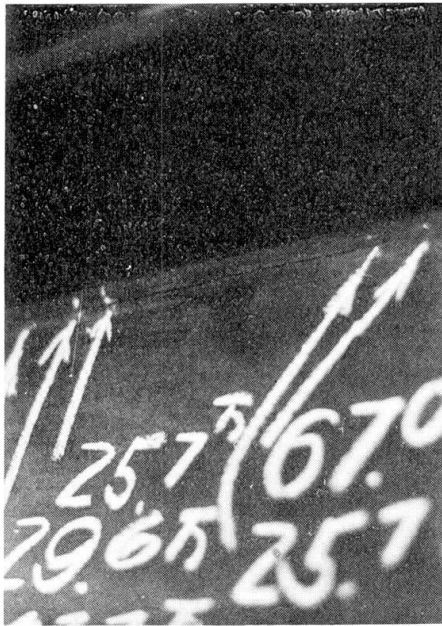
Crack Type BM-1 in Girder F-6.
